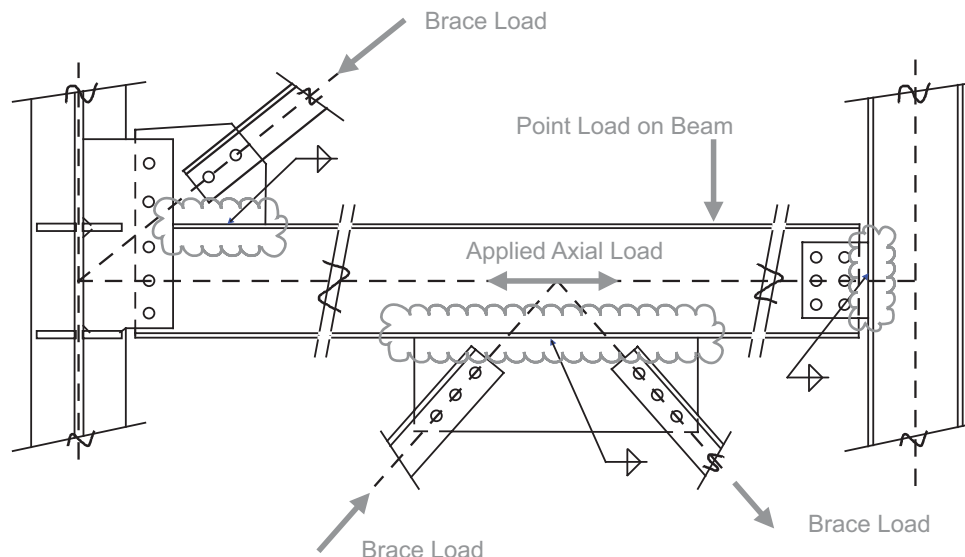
Fillet-welded connection plate elements under eccentric shear.
